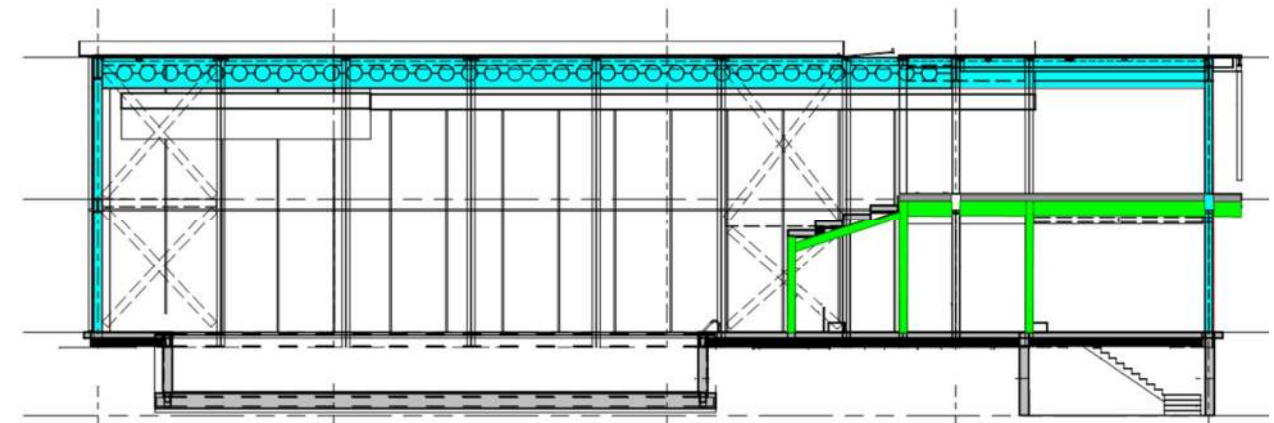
Structural Framing Concept – Long Span enclosure (blue) over traditional framed floor structures (green)
